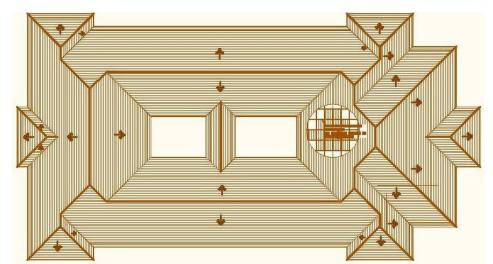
Roof plan of the Surveying/Geoinformatics & Building Departments
